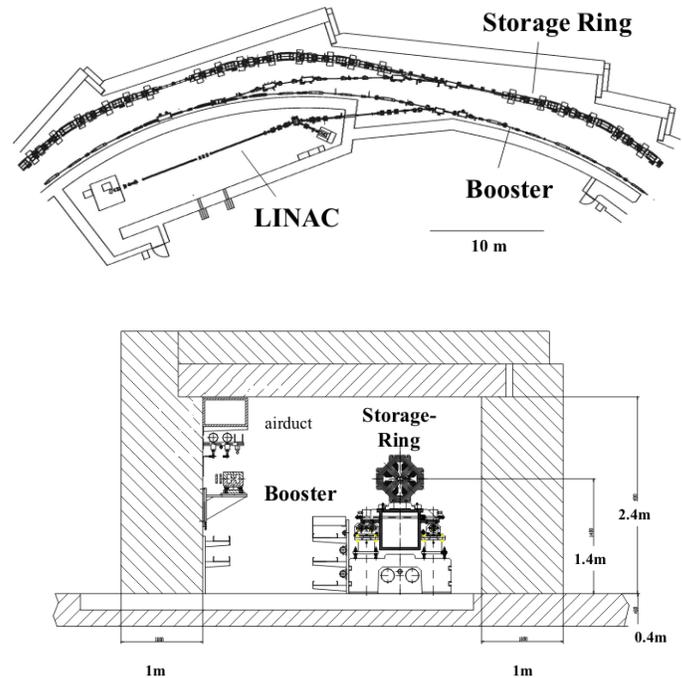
Facility layout and section through the booster and storage ring tunnel
